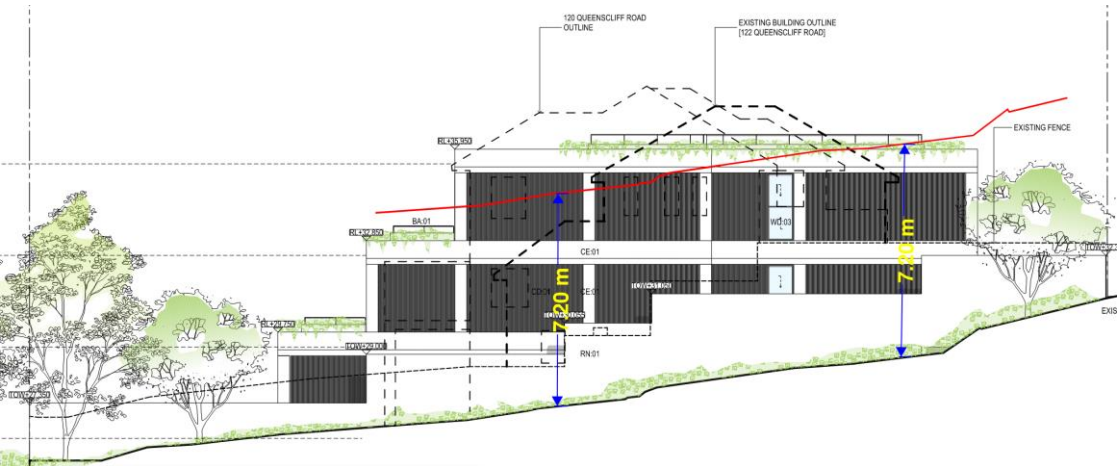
the existing and proposed buildings demonstrate modest exceptions to the DCP wall height control
